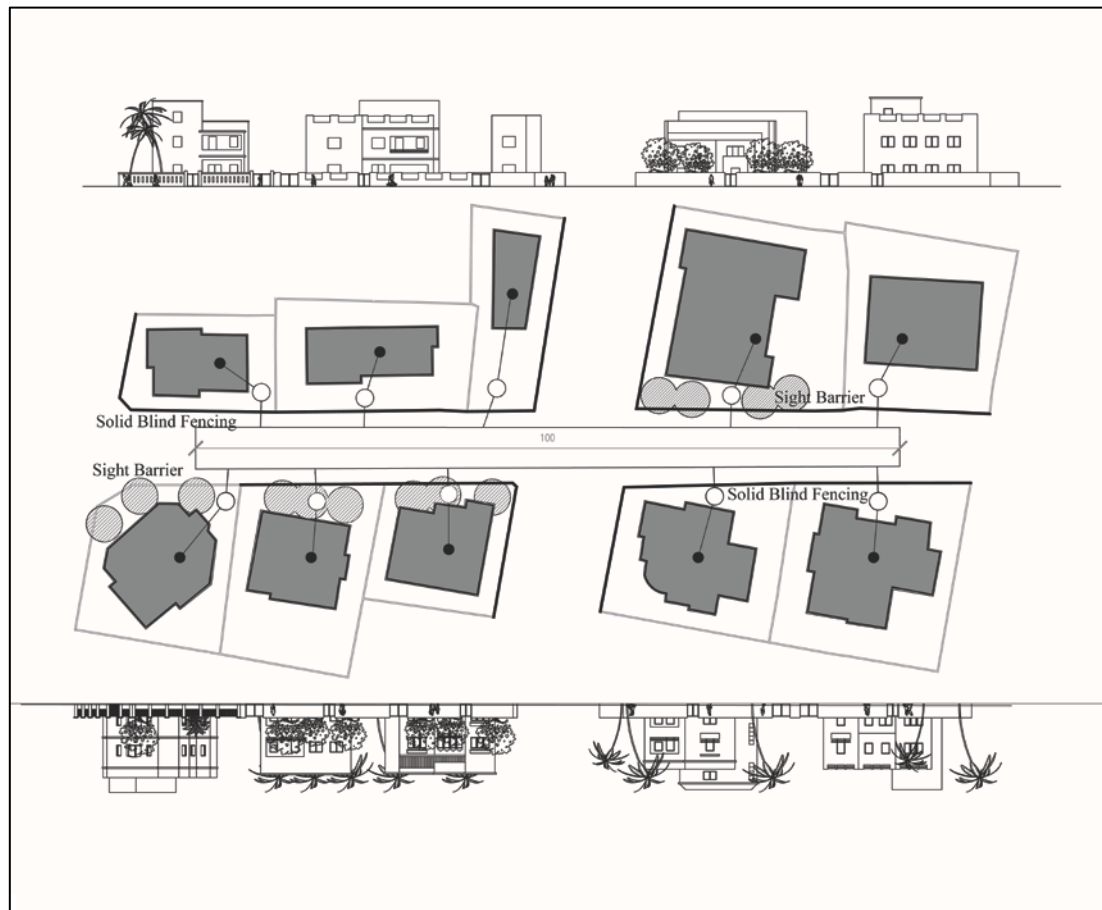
Constitutedness of the ground floor plan on the connecting street of the Garden City
